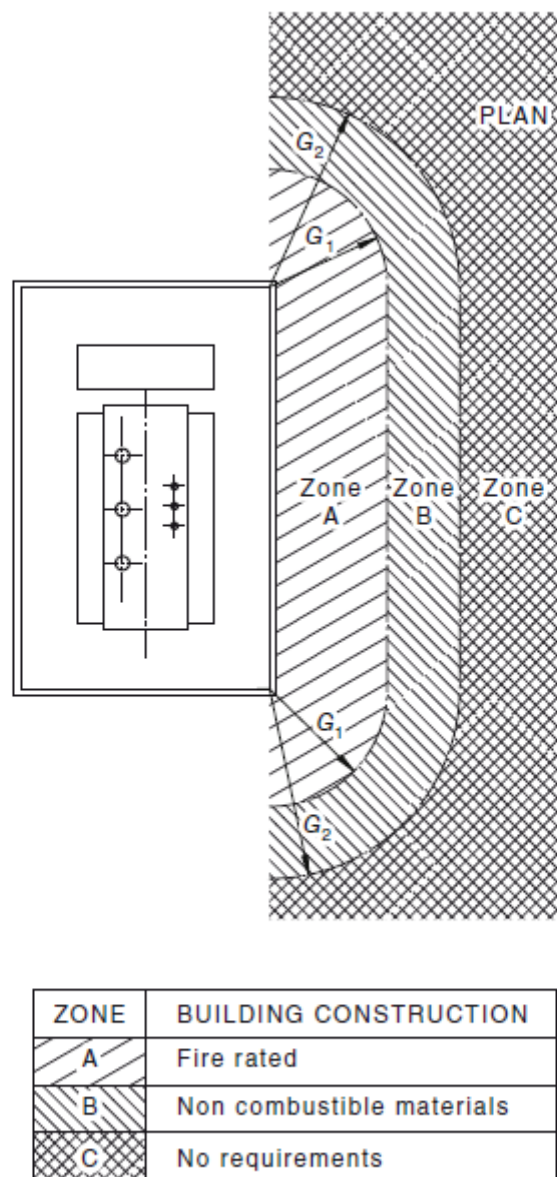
(A) FIRE EXPOSURE PROTECTION FOR BUILDINGS
